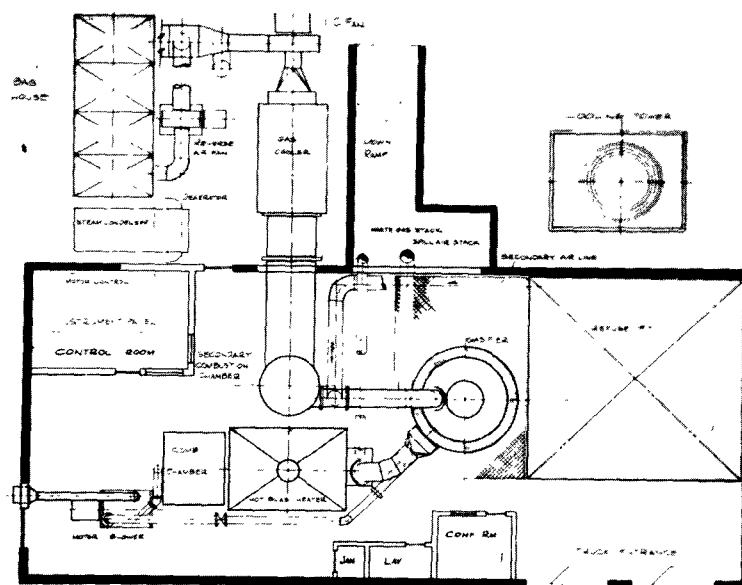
Plant layout and general arrangement of equipment. Truck entrance faces due east, as in Figure 3.
